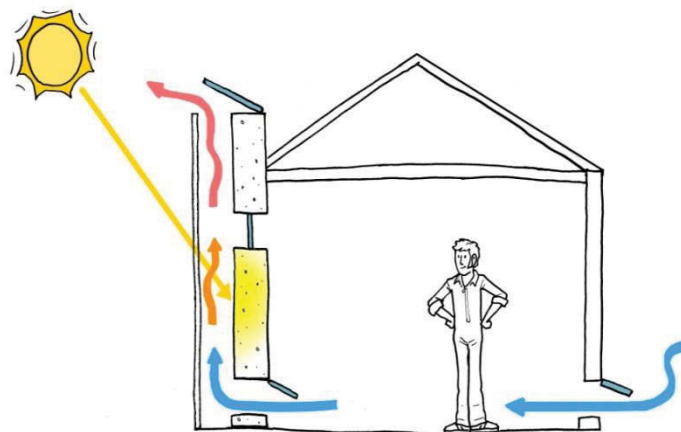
Typical Sketch of a Room Fitted with Side Wall Solar Chimney
